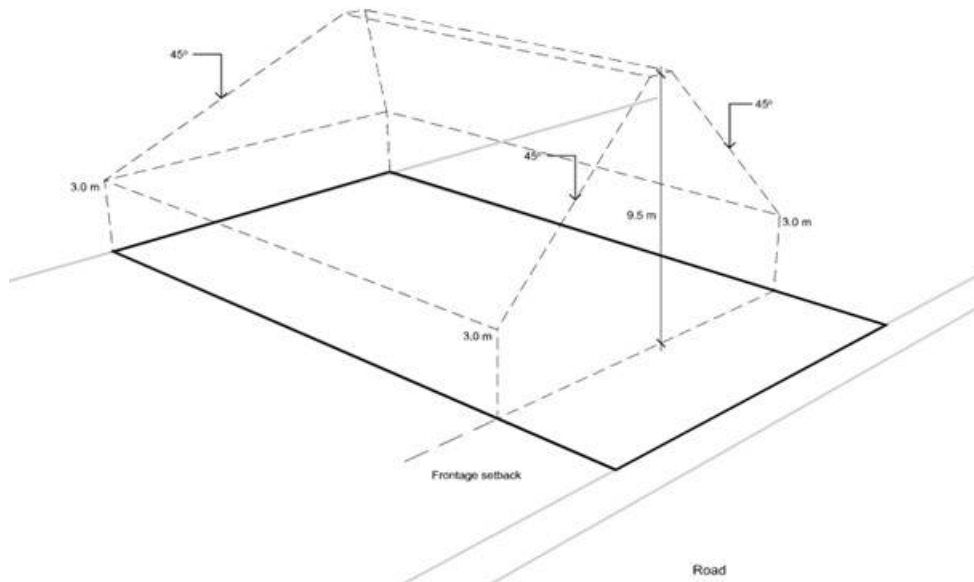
Building envelope for corner lots as required by clause DEV-S4.7.3
